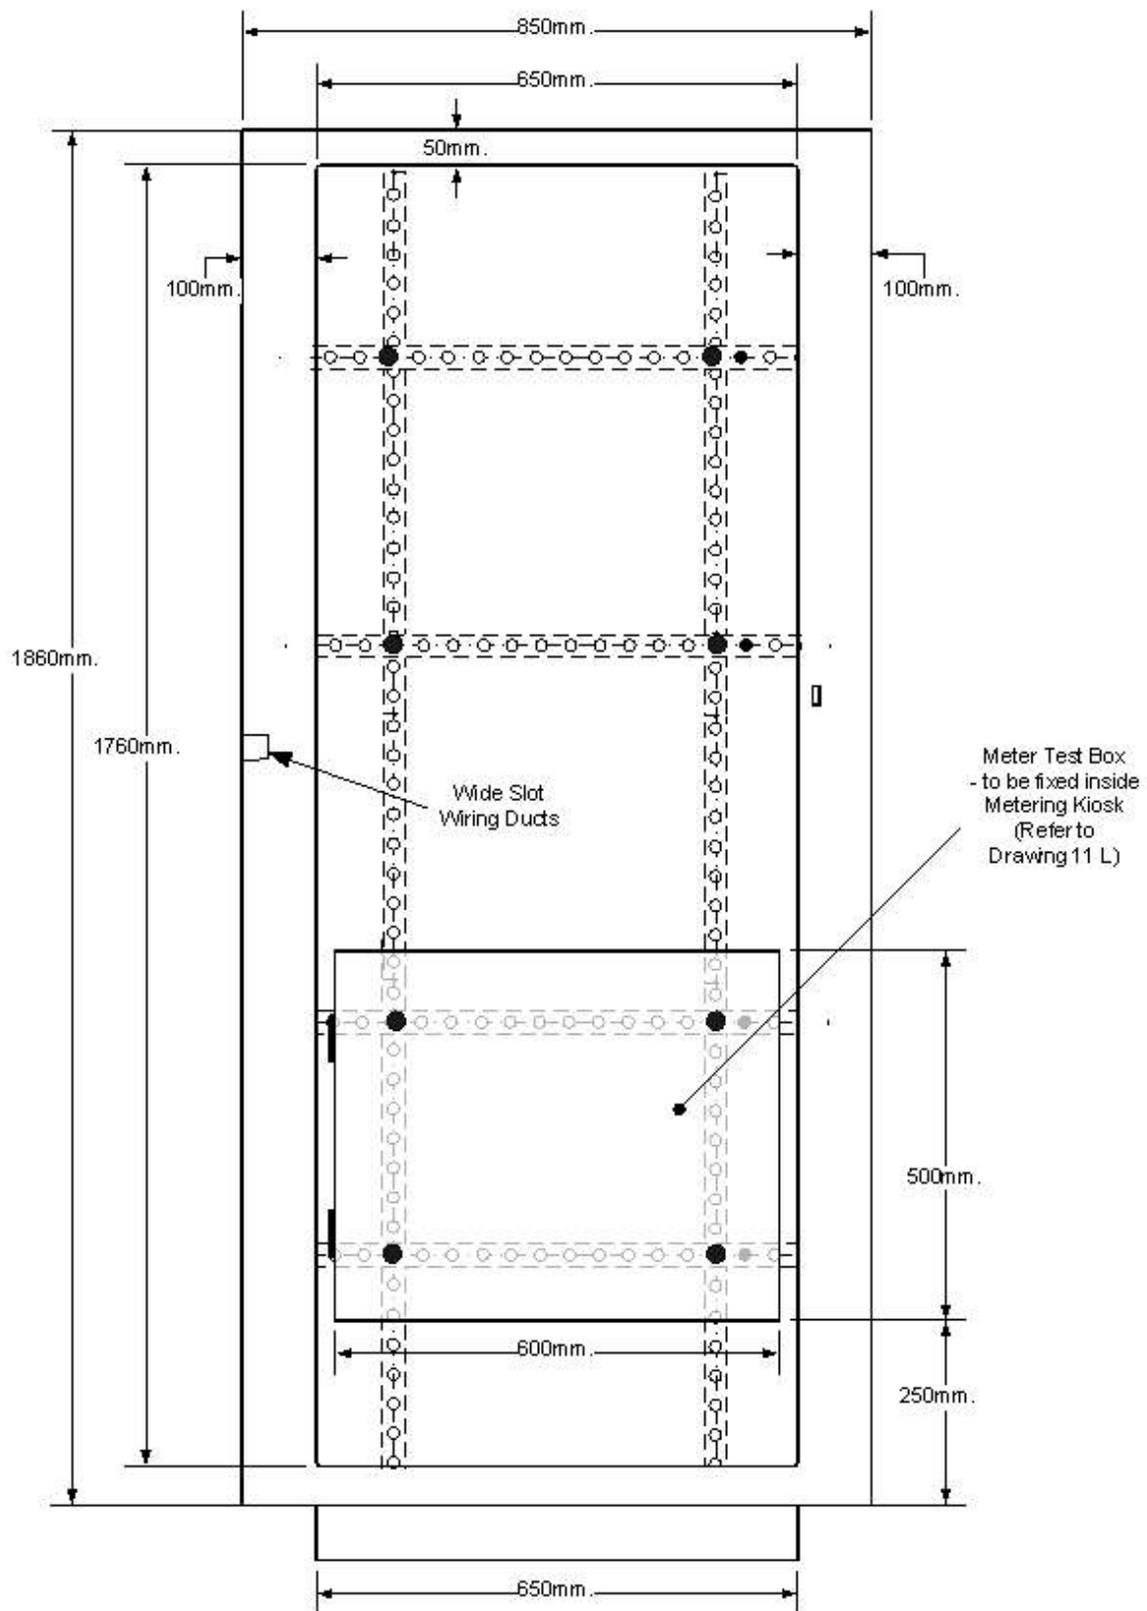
B : MVHV, 1 OR 2 FEEDER METERING KIOSK - Front View of Internal Door
